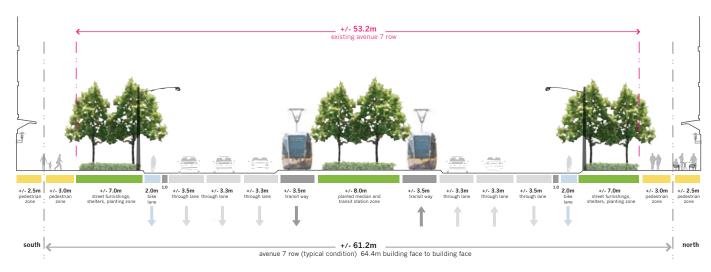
FIGURE B > SECTION OF AVENUE 7 LOOKING WEST (AT VIVA RAPIDWAY STATION)
